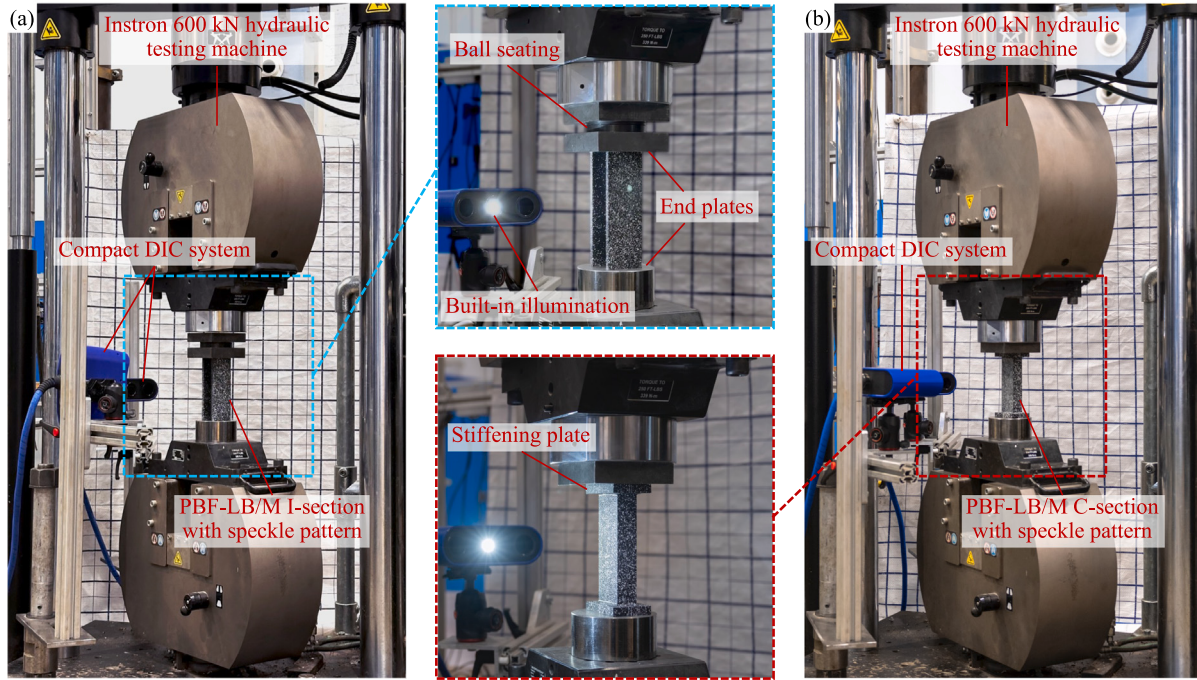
Stub column test setup for (a) I-sections and (b) C-sections.
